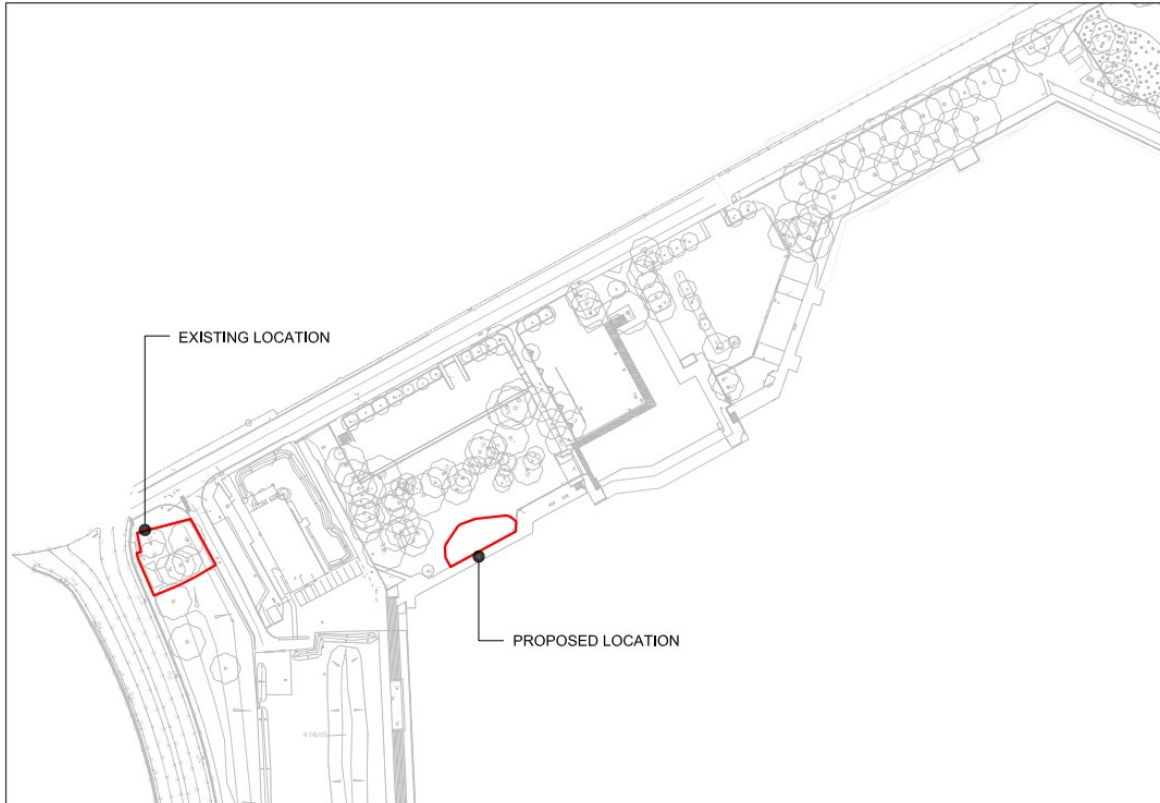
Existing and Proposed Gym Location (Peabody, 2023)
